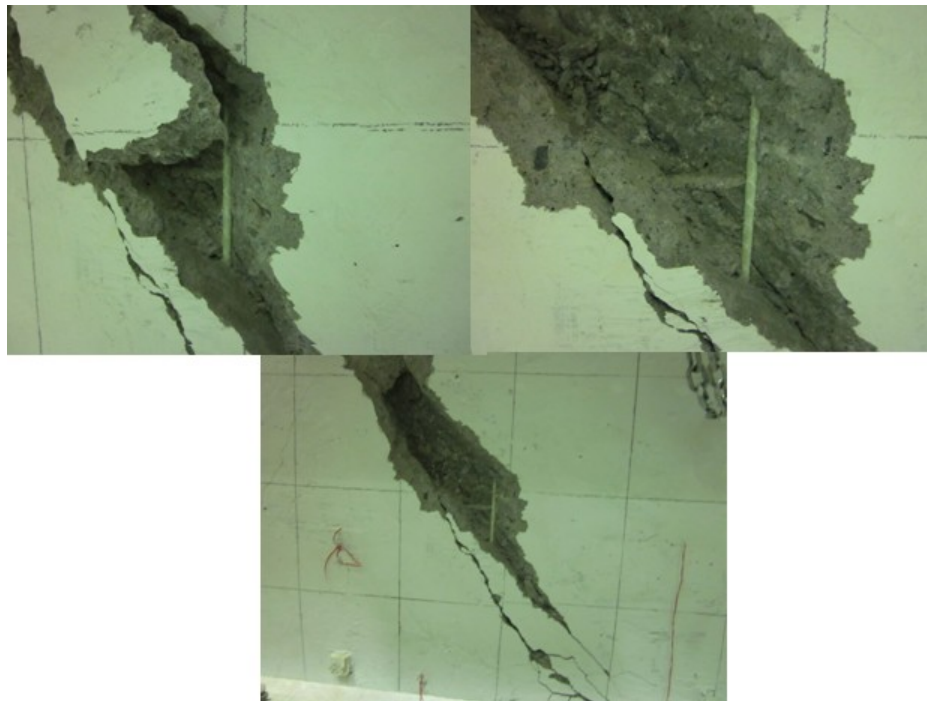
The crack intersects the web reinforcement in specimen A1/75
